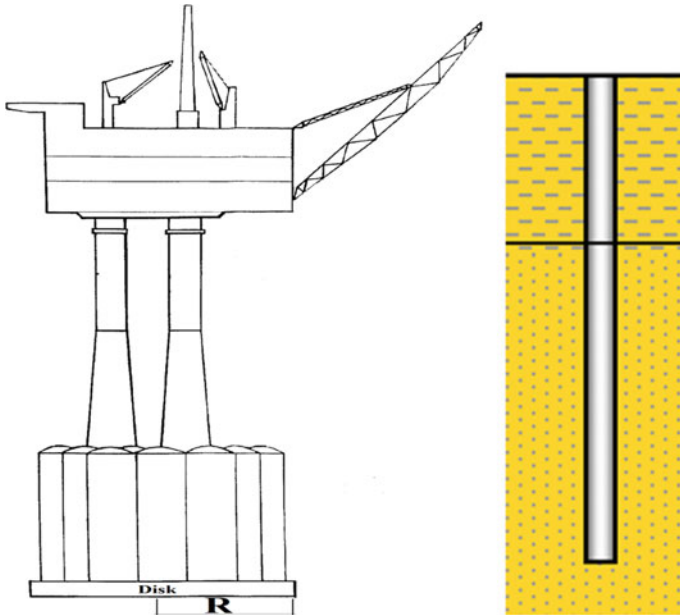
A GBS structure with a shallow foundation directly resting on soils (left, courtesy of Aker Solutions) and a pile as a type of deep foundation penetrating into soils (right)
